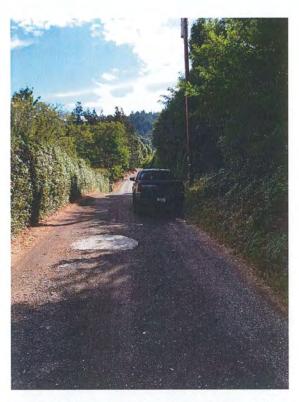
RP 6. Typical section of Chambers Rd (County maintained. State Road No.: 2D020). Vehicle traveling east, photo taken facing east.
